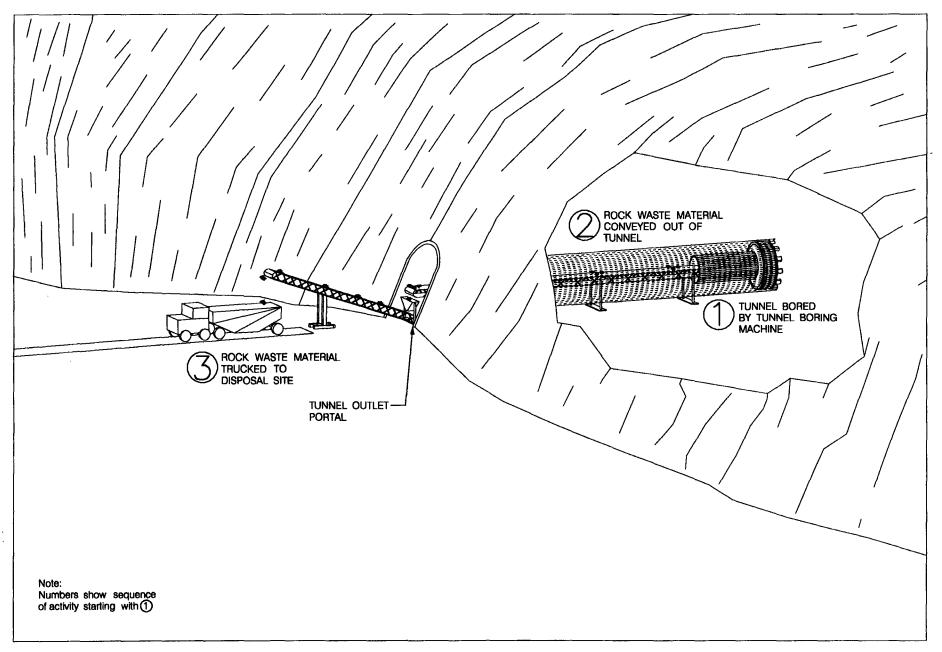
Schematic Drawing of Typic⁻¹ Tunnel Boring Sequence
